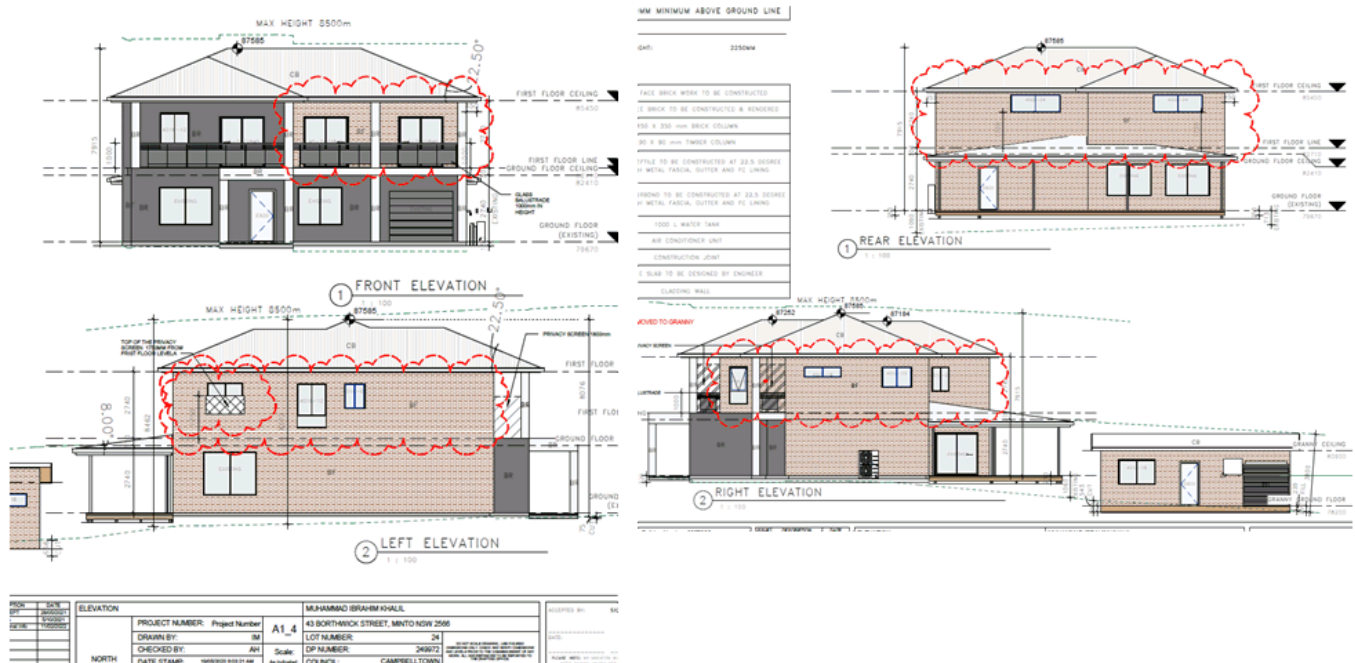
Architectural plan showing the External material of the First floor partial render and rest to be brick face and additional window
